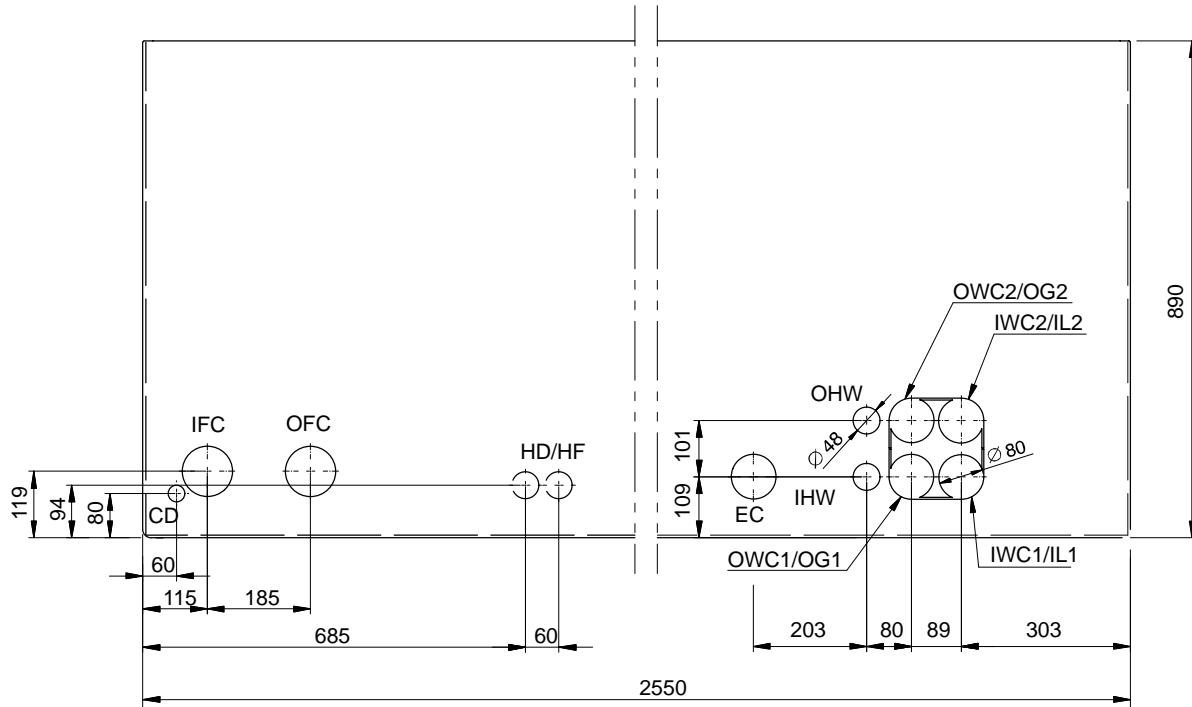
p Refrigerant, water and electrical connections Liebert Hiross HPM M 31...66
